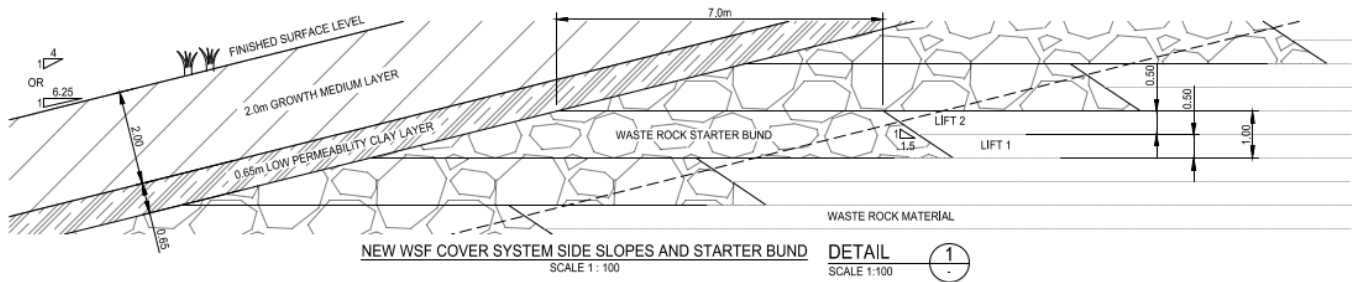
Typical WSF Capping Section, Side Slopes and Starter Bund - Detail 1.
